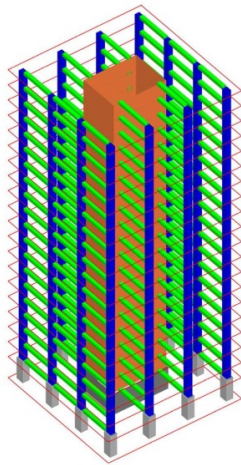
Isometric of proposed timber structural system for twenty storey building with a rectangular core of integrated CLT panels, glulam columns and floor beams
